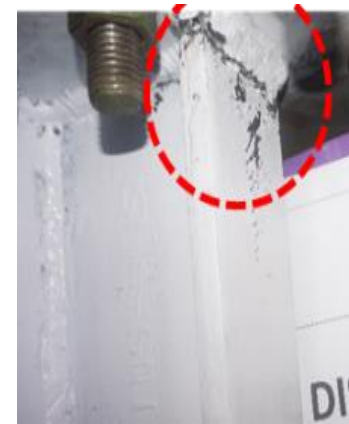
(f), Failure condition: fracture at weld-adjacent flange region (specimen LL-1, 8B Cycle).
